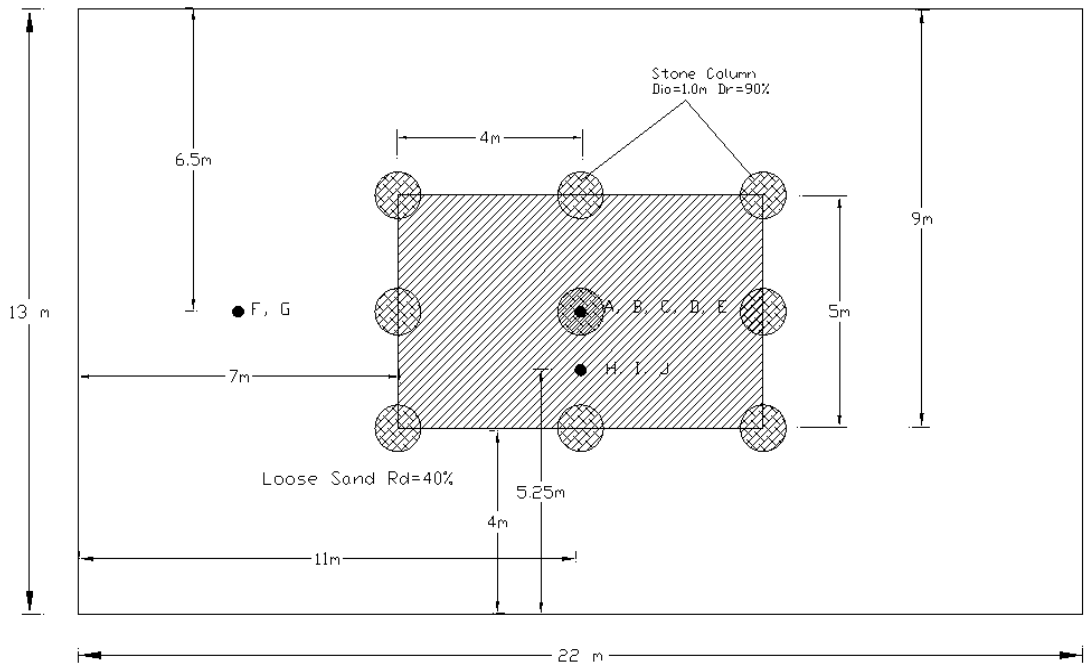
(f) Benchmark model with Footing and stone Column (Plan)
